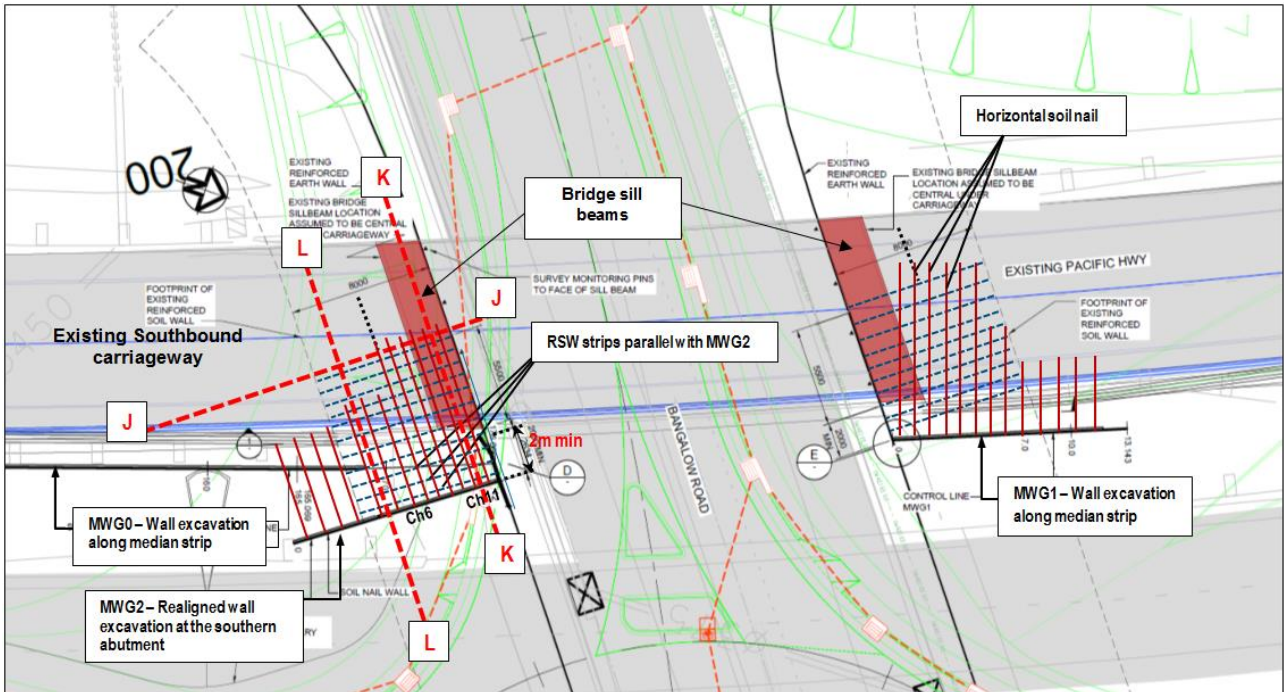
Horizontal soil nailing for stabilisation of wall excavation across existing RSW bridge abutment.
